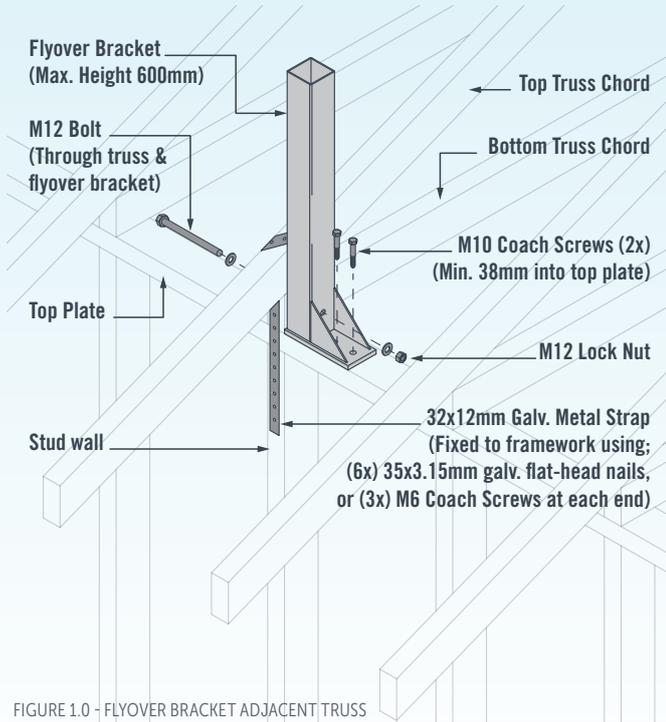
FLYOVER BRACKET ADJACENT TRUSS
